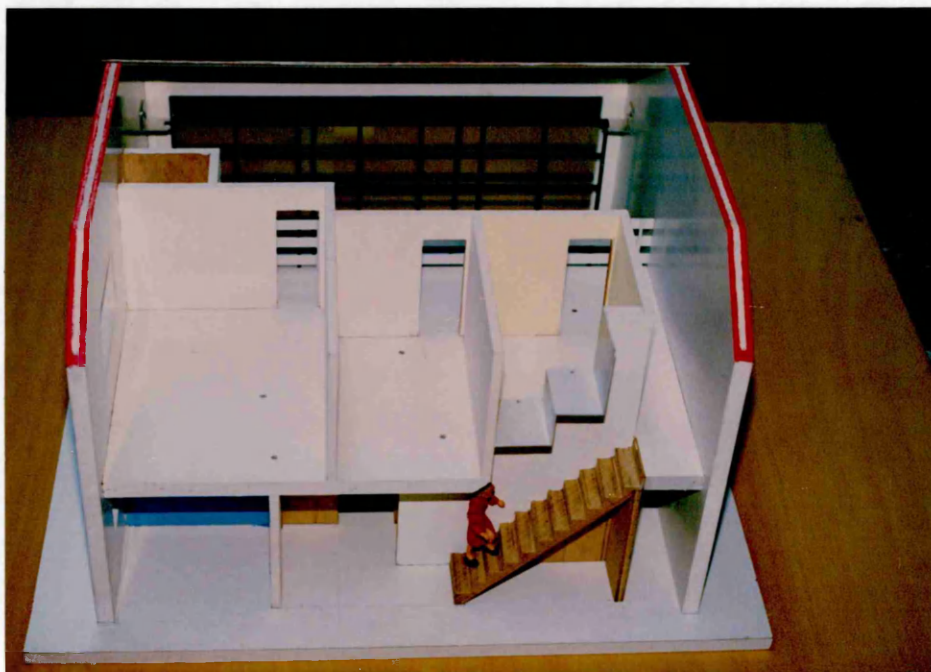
(b) The House - North, showing the plan view. The transwall modules can be clearly seen in the background.
